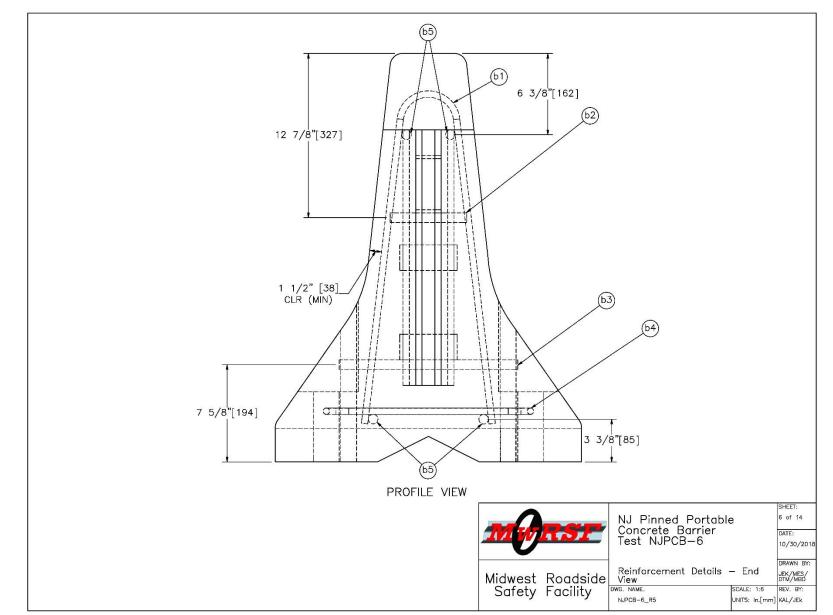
PCB Reinforcement Details – End View, Test No. NJPCB-6
